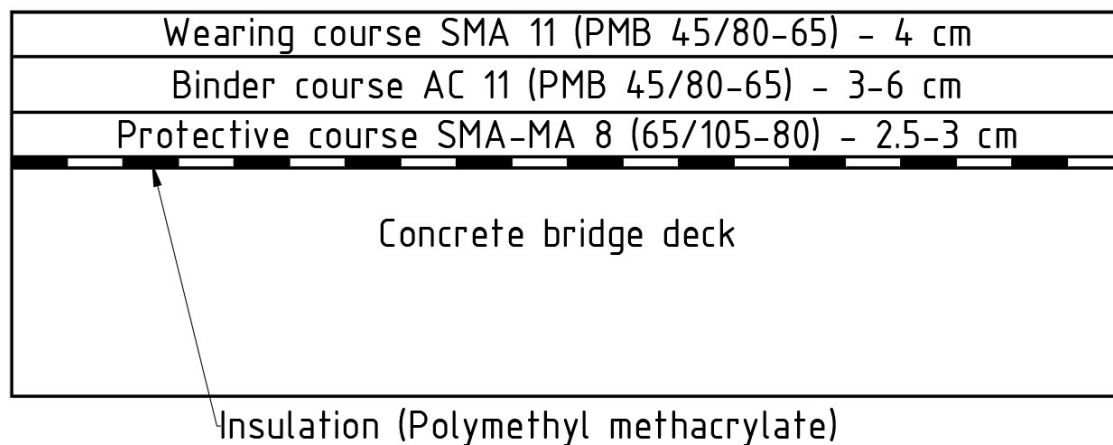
Pavement structure on the Trasa Zamkowa bridge.
